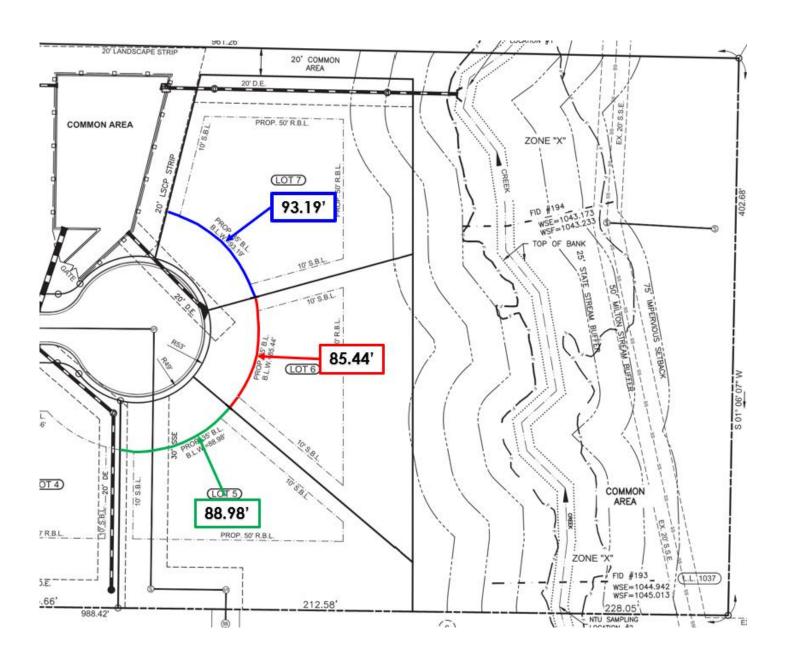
# Exhibit A (Crescent Ridge Variance Site Plan - Zoomed)
